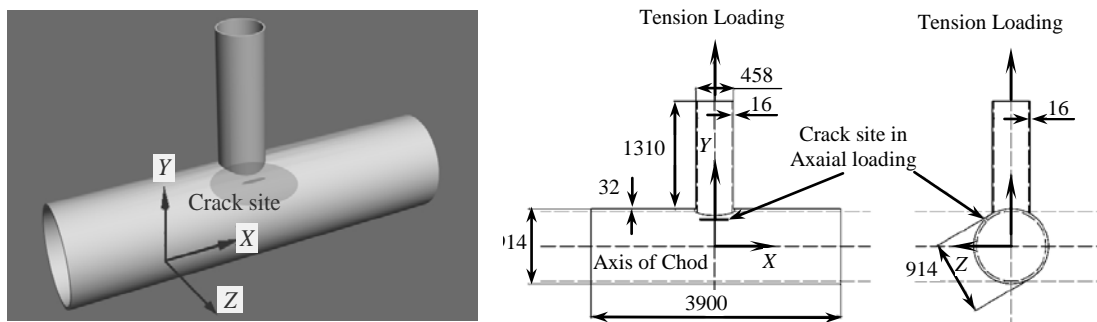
Geometry of a common T-joint and position of a surface crack (the dimensions shown are in millimeter)
